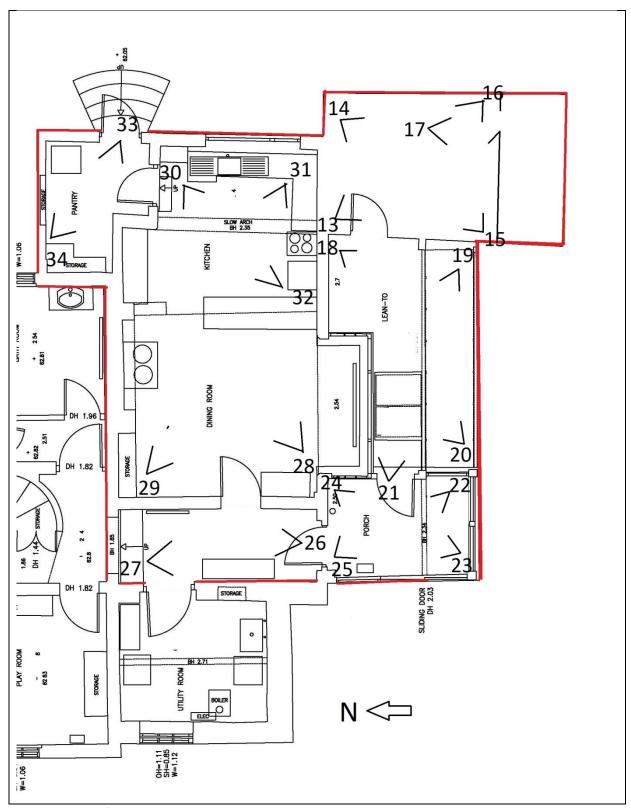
Plan of Recorded Building Interior with Photo Locations Annotated Location Plan Not to Scale do not scale off drawing
